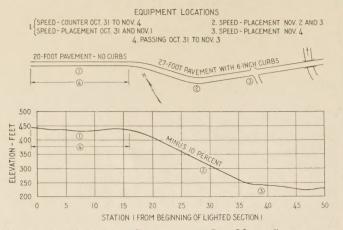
PLAN AND PROFILE OF ONE-MILE SECTION OF LIGHTED HIGHWAY ON U.S. ROUTE 422 NEAR CHAGRIN FALLS, OHIO.
